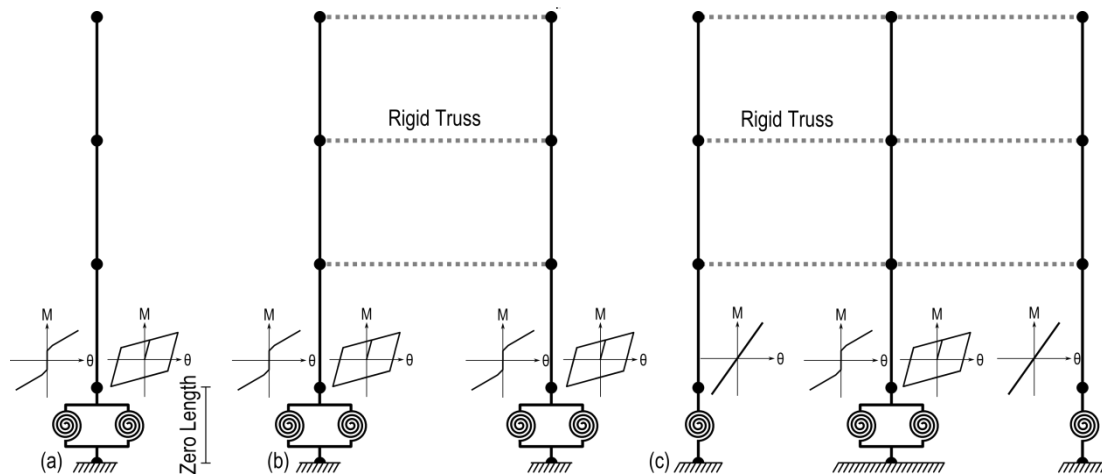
Rotational spring models overview. (a) Single wall; (b) coupled walls; (c) column-wall-column system.
